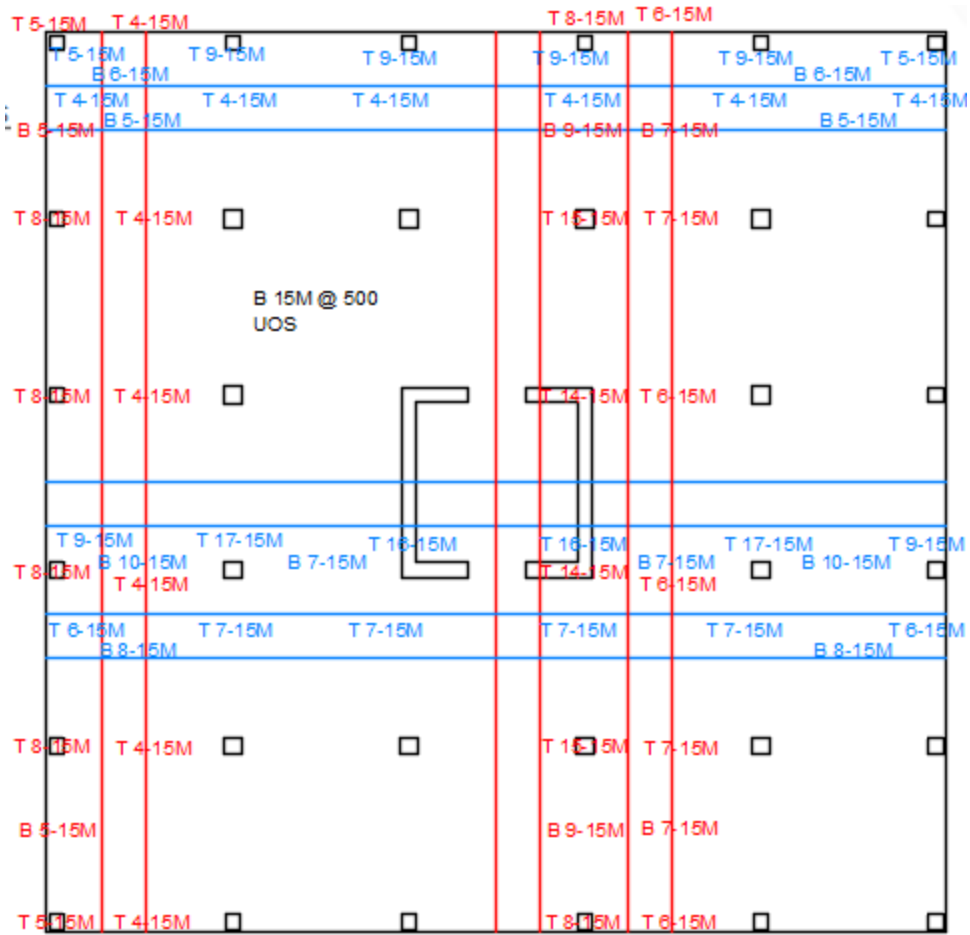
Typical Slab Top and Bottom Reinforcement by Design Strip (Red for N-S and Blue for E-W)
